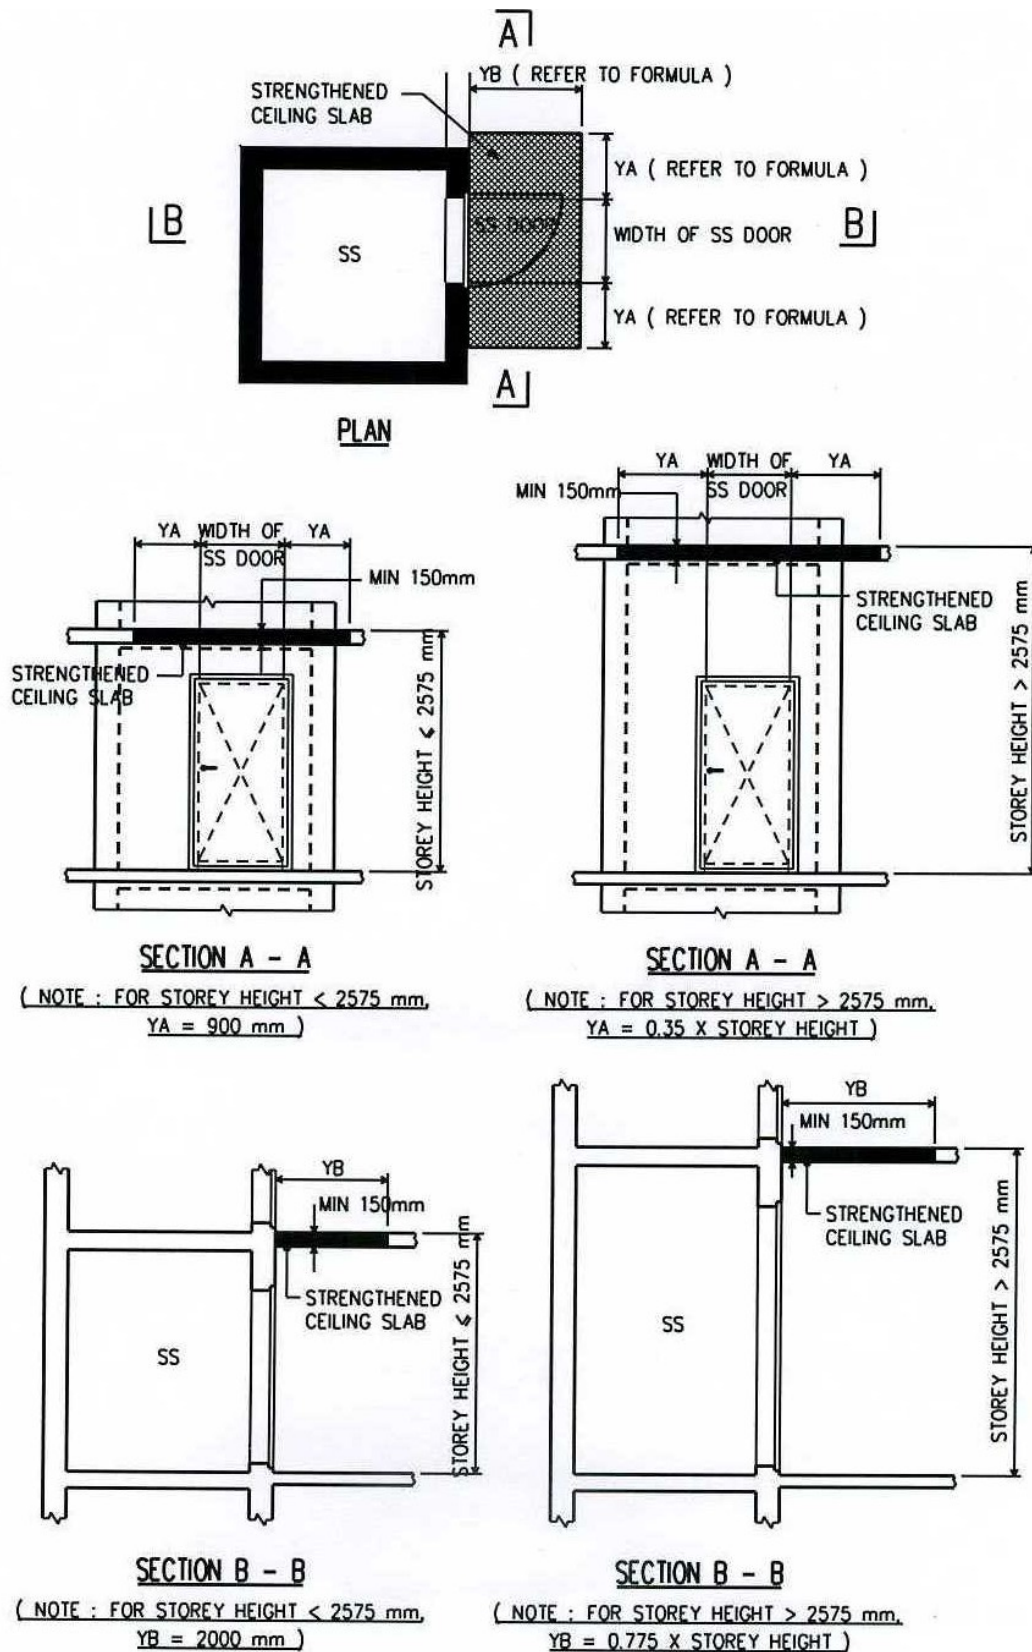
REQUIREMENTS FOR STRENGTHENED CEILING SLAB IN FRONT OF SS DOOR
